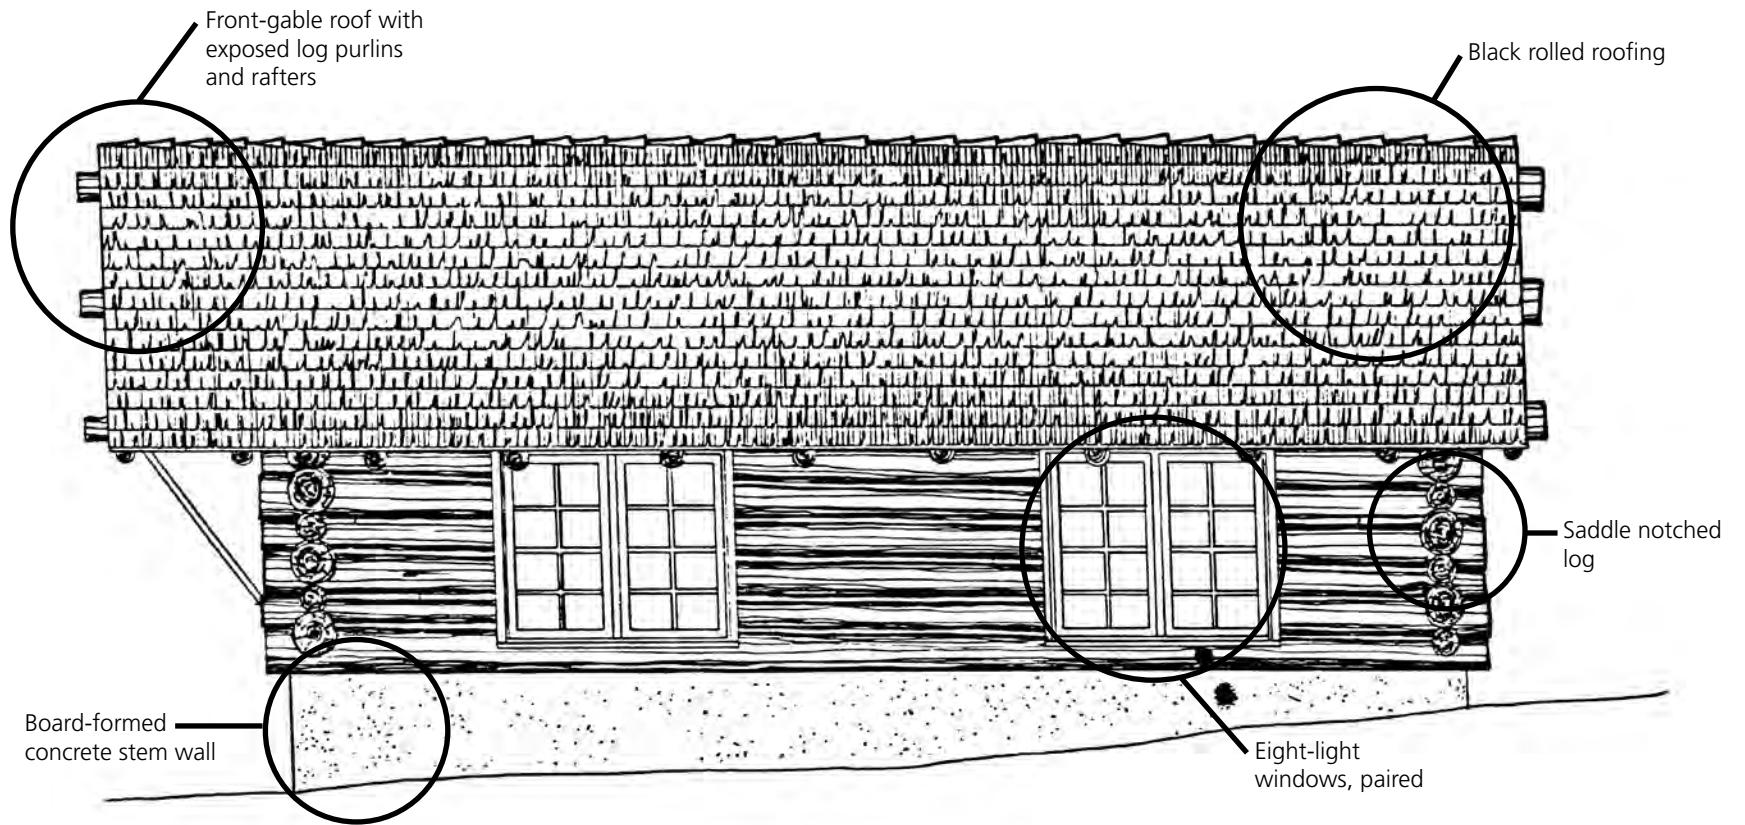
Building 107, South Elevation, Historic American Building Survey, National Park Service, W. Vandeventer and Dave Snow, 1986 (NPS Alaska Regional Office Files)
